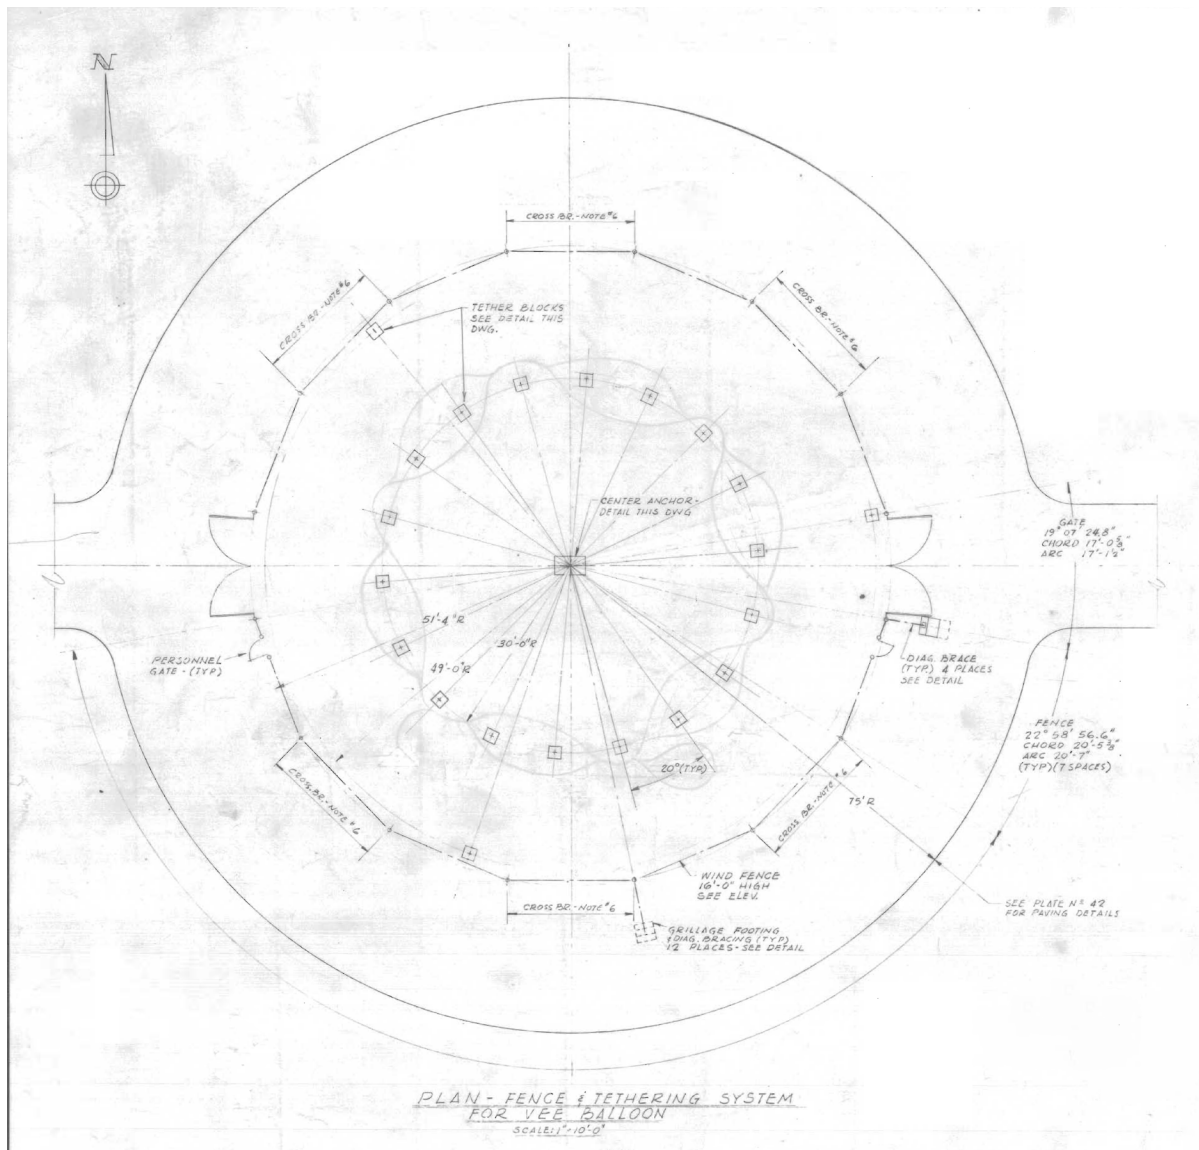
Plan view of Balloon Inflation Facility from 1963 WS-KR plans.
